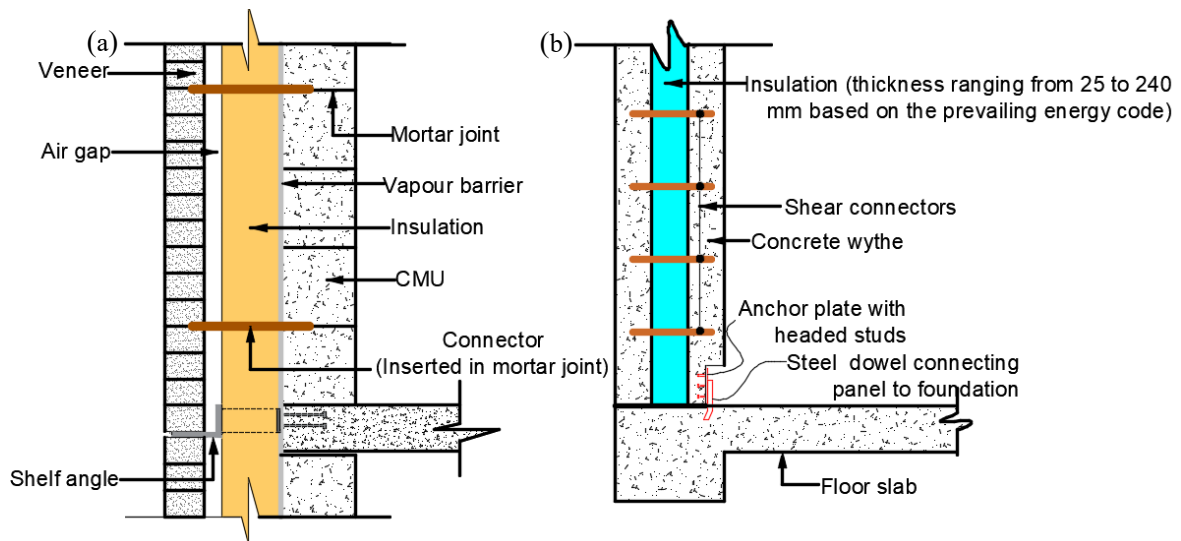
(a) Double-wythe cavity masonry wall (b) insulated concrete wall
